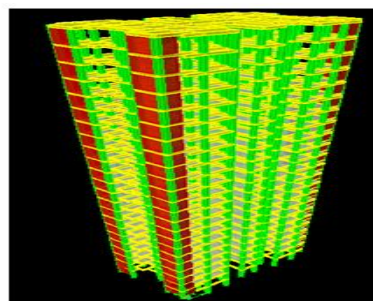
3D View of G+21 Storey RCC Building with Edge Shear Wall
